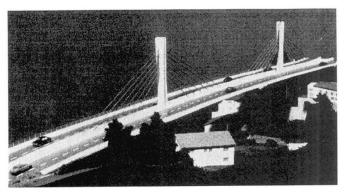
− A cable-stayed bridge, in St° Tirso.
